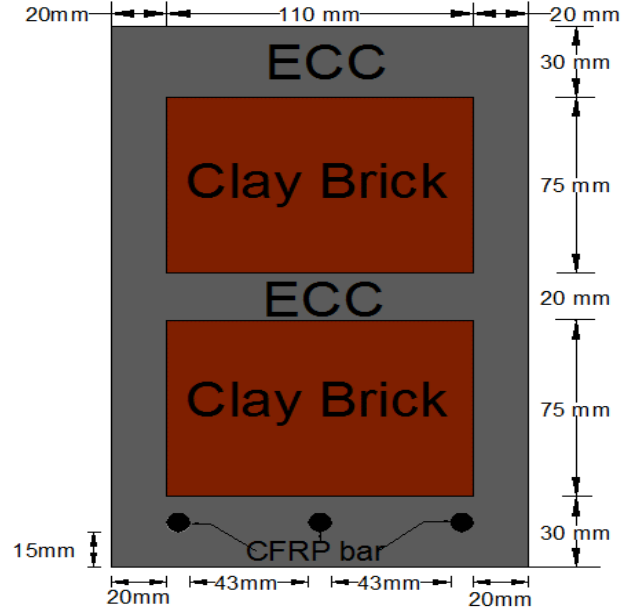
(b) Cross-section of reinforced masonry beam with ECC as bed joint
